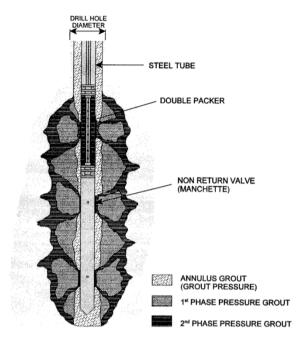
7. Use of Reinforcement Tube as a Tube á Manchette Postgrouting System
